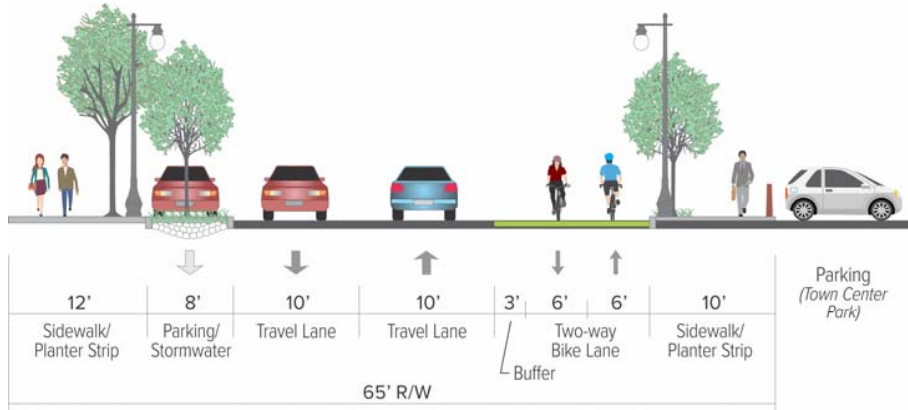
TOWN CENTER PLAN CROSS-SECTIONS (CONT.)
